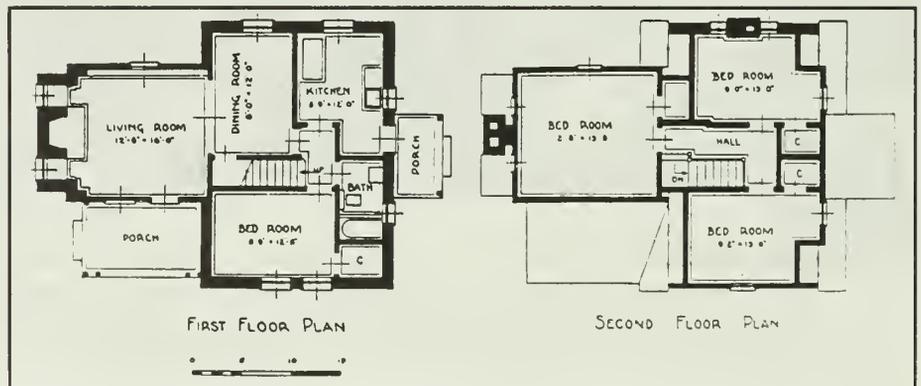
Plans of another house at Cumberland Homesteads, TN. From *Small Houses* (1939).
